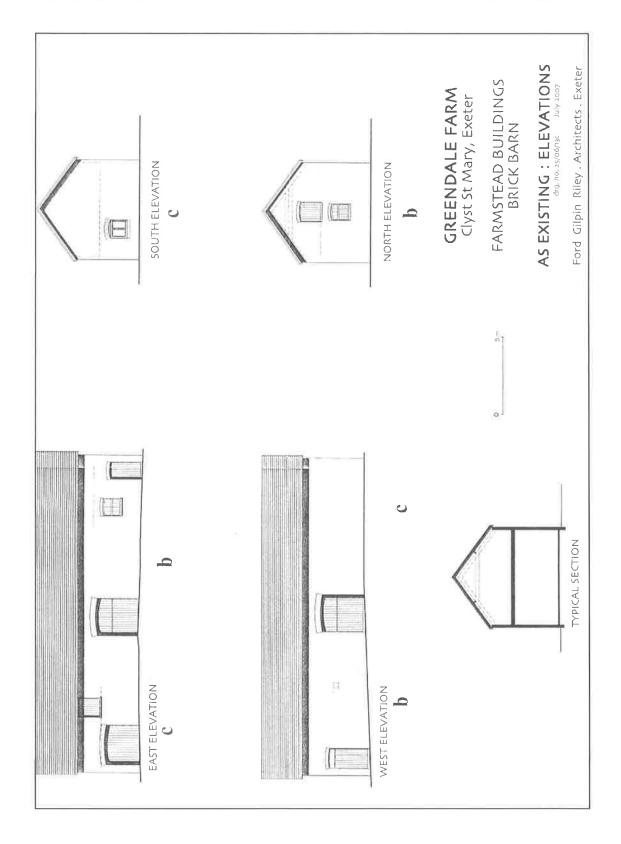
Elevations of the Barn and Cart Shed (Buildings B and C).
